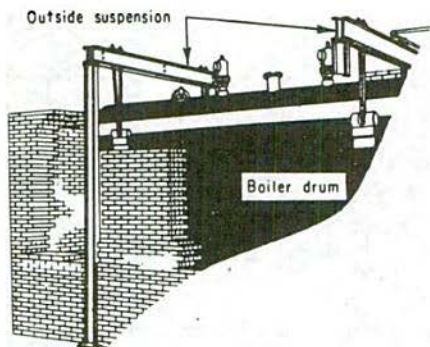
Horizontal-return-tubular boiler of over 72-in. diam must have outside suspension.
